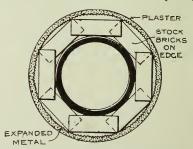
Iron Column protected with Bricks, Expanded Metal, and Plaster.
